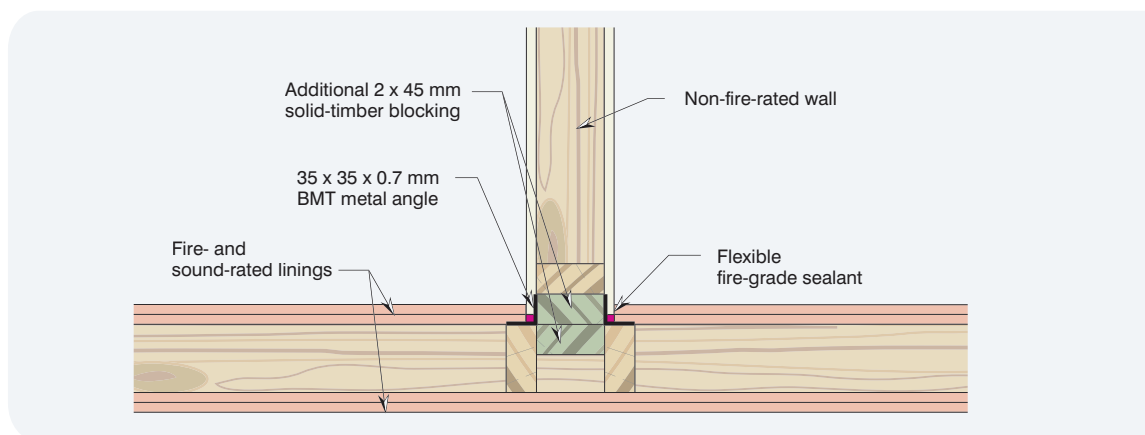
Non-rated wall abutting fire-rated wall using timber blocks and 35 mm metal angle – FRL 90 minute – plan view.
